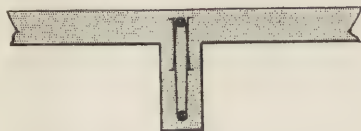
Section of Cantilever part of Beam in Fig. 300.
